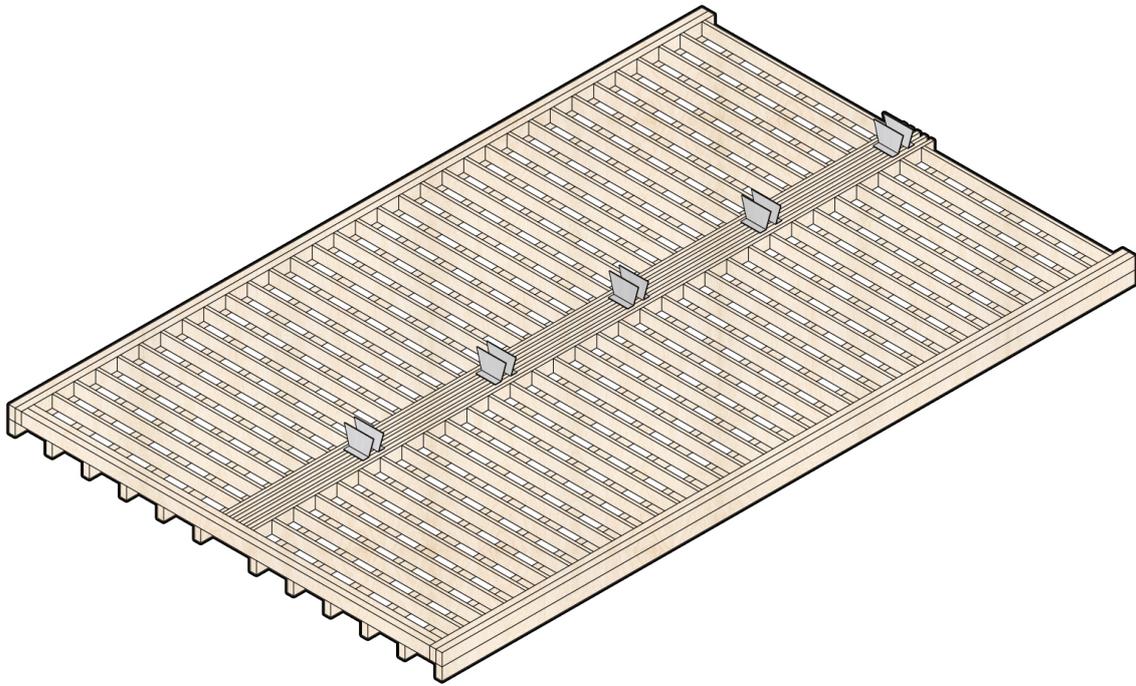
Construction stage 2 placing truss shoes in centre of foundation. Original author
